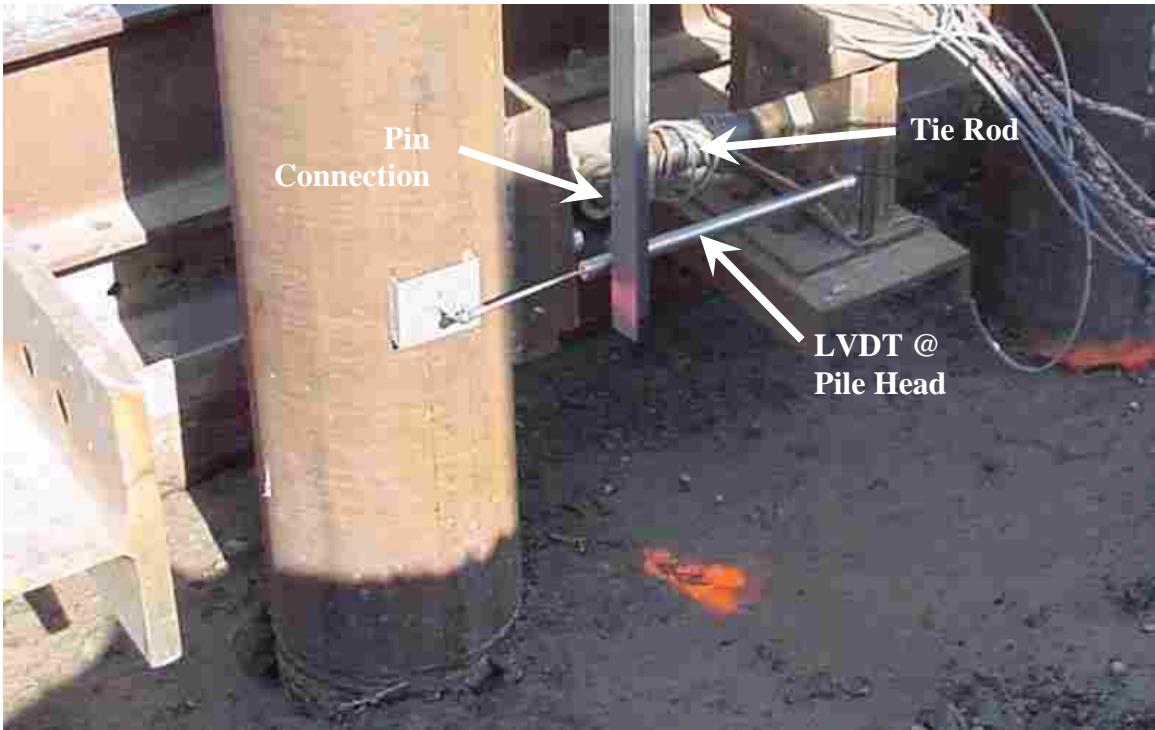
LVDT and tie rod connections to individual piles at pile head.
